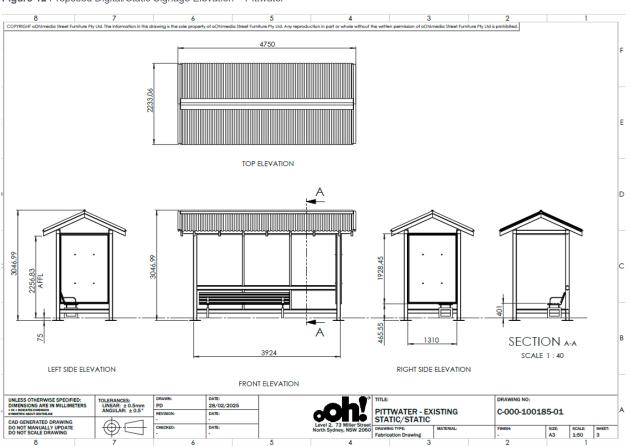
Proposed Static/Static Signage Elevation – Pittwater
